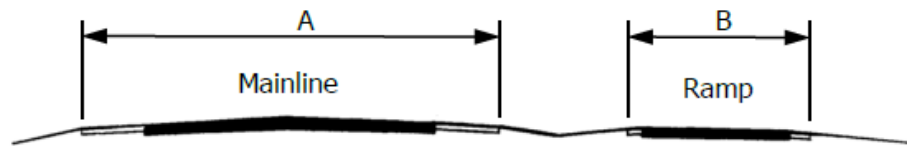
Approach roadway cross-section view for a mainline and a ramp that are carried across separate bridges.
